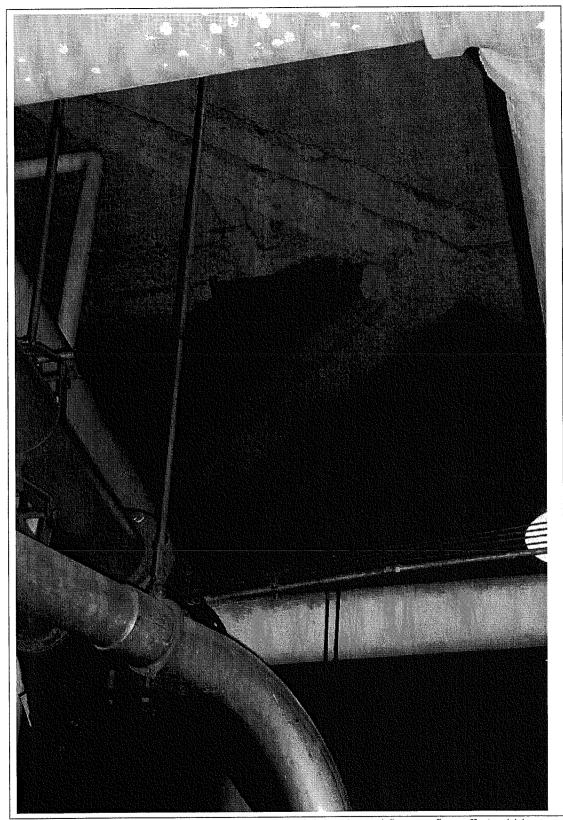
B floor east mechanical rm - view of delaminated fireproofing off steel I-beam
